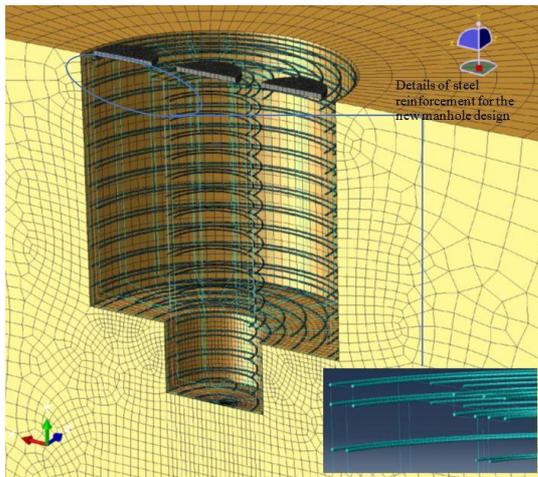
Details of steel reinforcement for new manhole design buried in the soil model.
